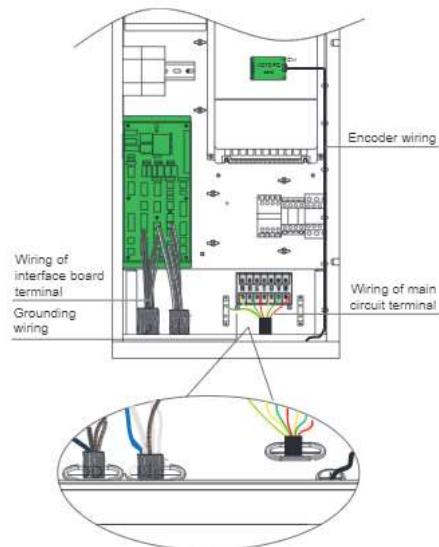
Wiring of external interfaces of machine-room control cabinet
